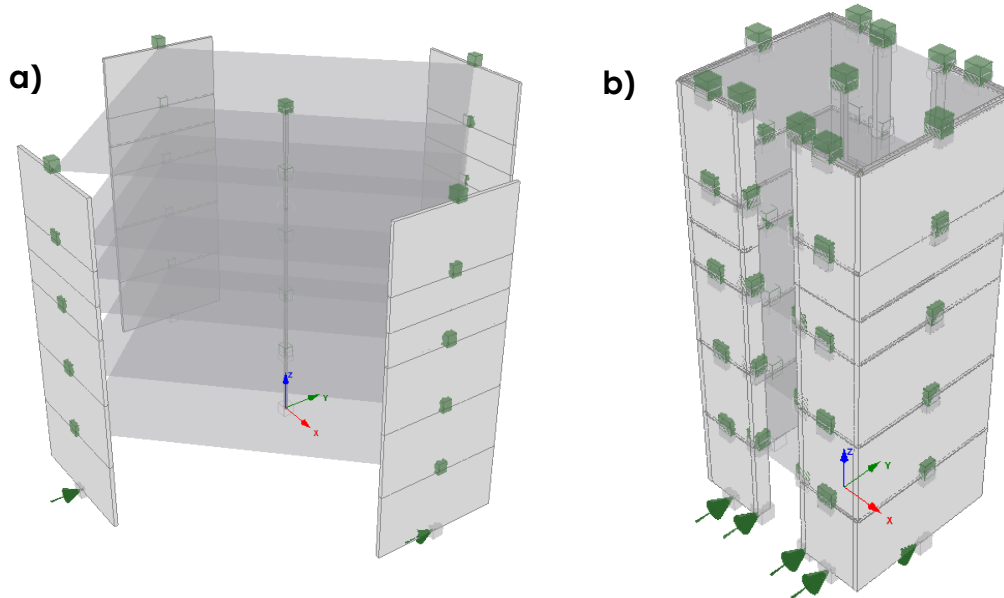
SEISMOSTRUCT MODELS FOR (A) RECTANGULAR (PERIPHERAL) WALL BUILDING AND (B) C-SHAPED WALL BUILDING
